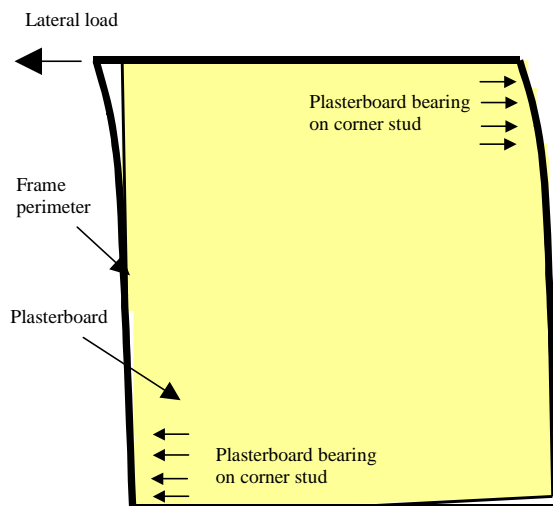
Schematic deformed shape of the frame and plasterboard for Wall 1.
